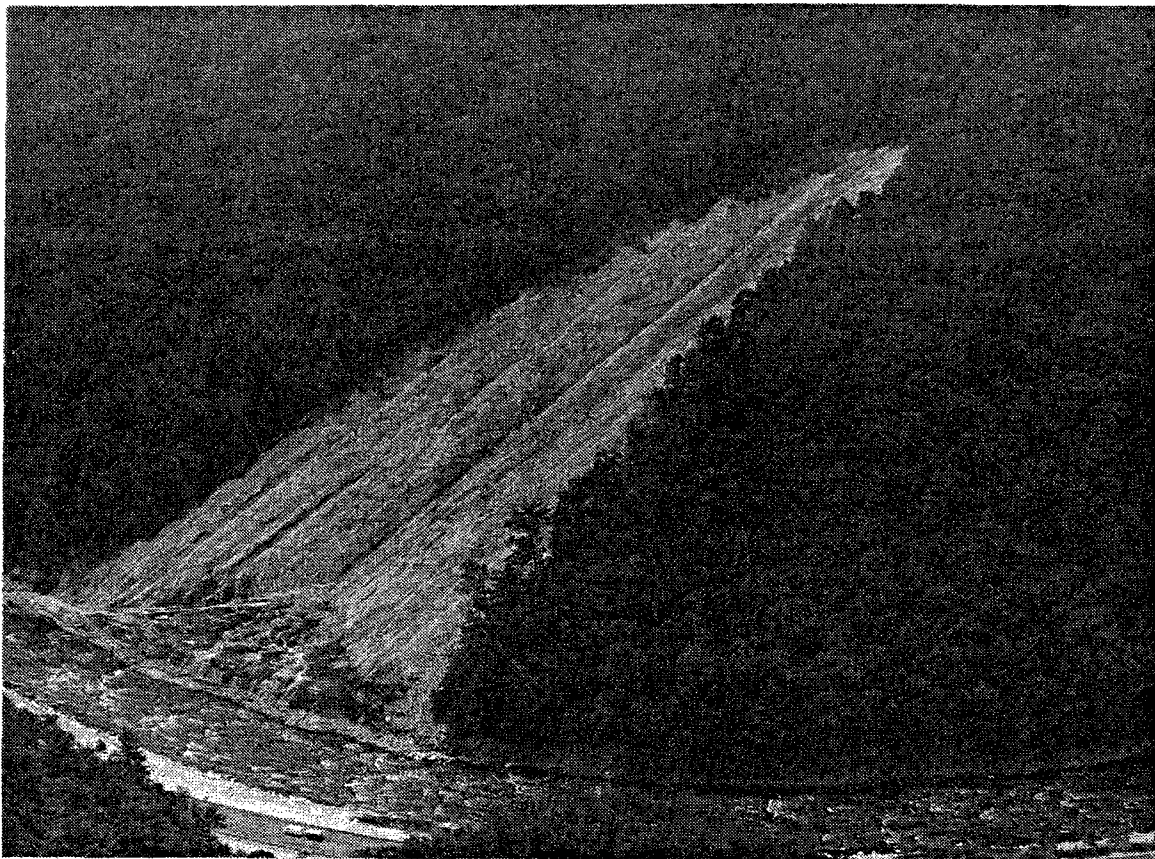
The Waterville slide as seen in June 1975. The view is toward the west. Note that the slope pavement has been replaced by boulder rip-rap.
